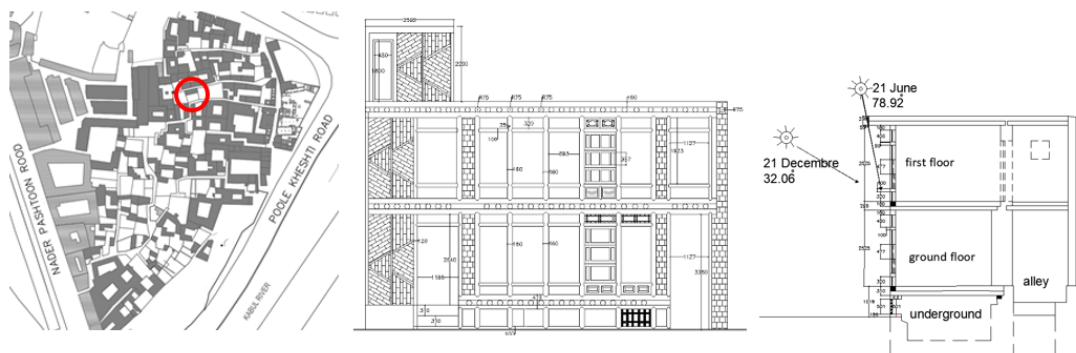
Peacock house, in Murad Khani residential neighbourhood. From left to right, Murad Khani layout, timber frame with mud-brick infill, bioclimatic cross-section.
